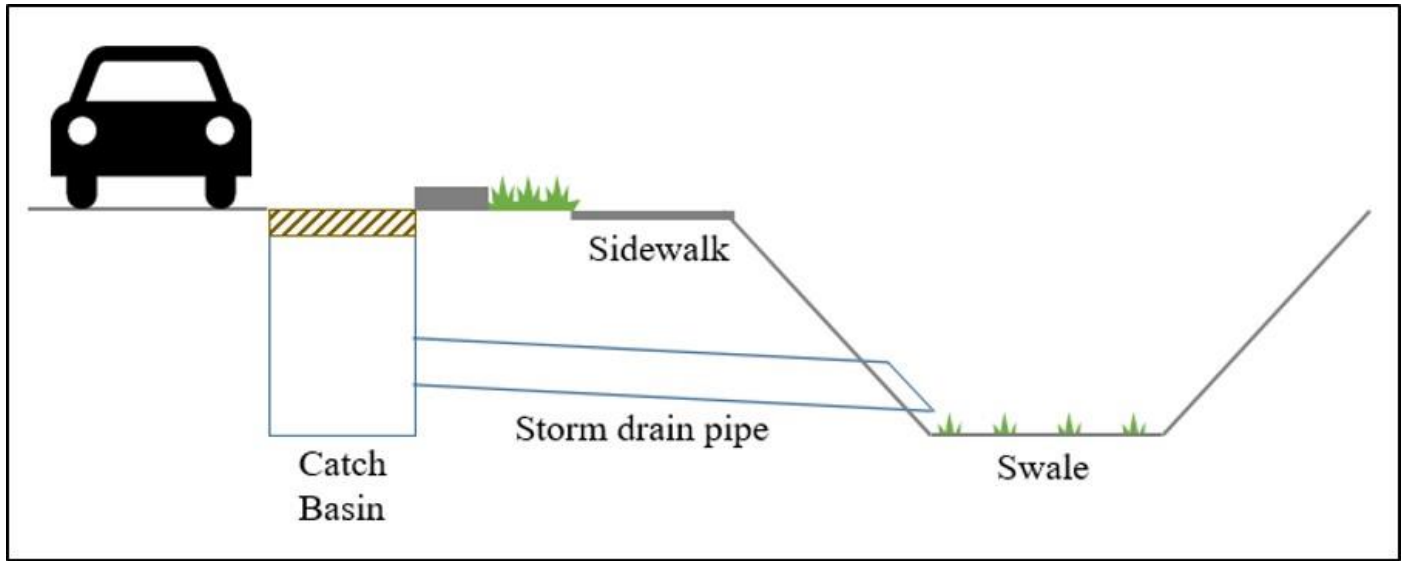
Typical Cross Section of Stormwater System in the Study Area
